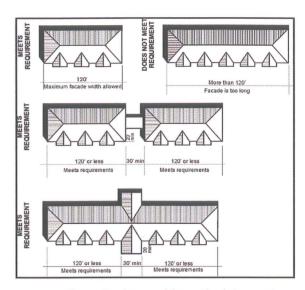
Acceptable methods to meet building modulation (dimensions in text prevail).
